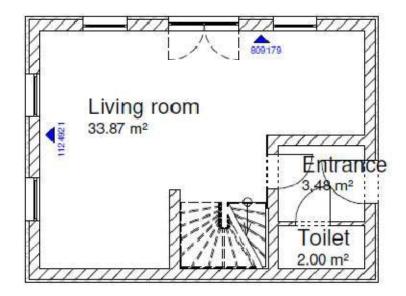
Plan of the first floor of KLG Hagedorn, House 2 showing the data logger locations
